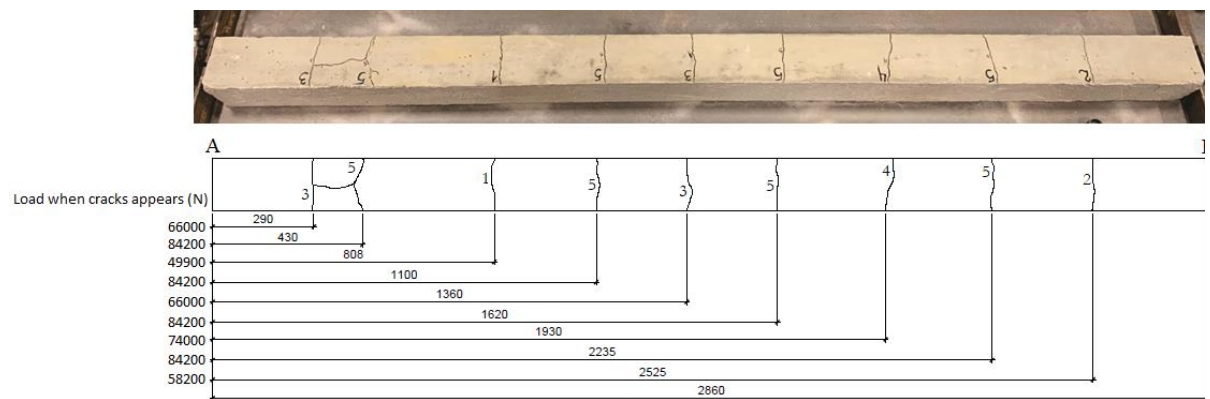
Prism test and crack pattern: #6 rGFRP – specimen 1.
